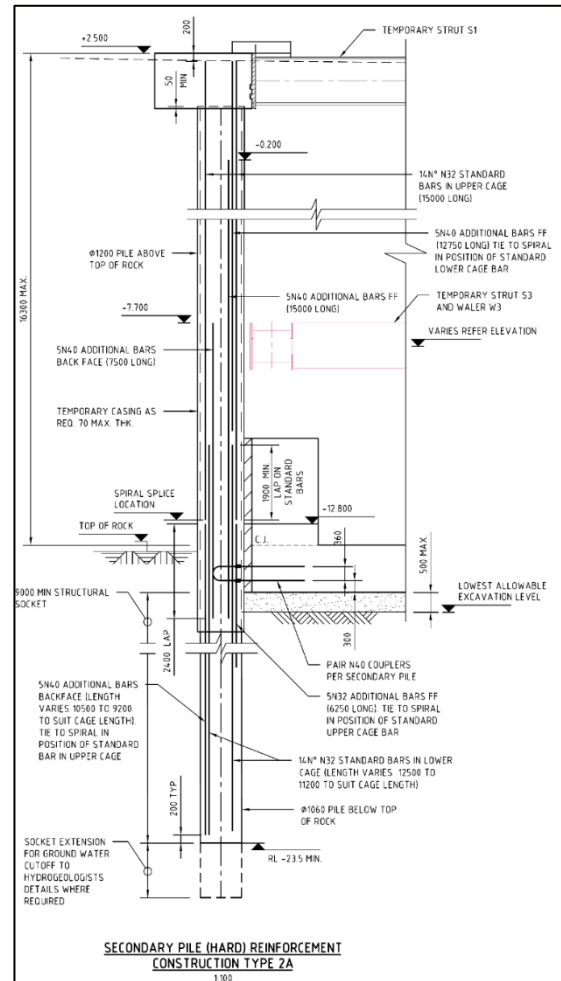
Typical reinforcement in adopted secant pile wall scheme
